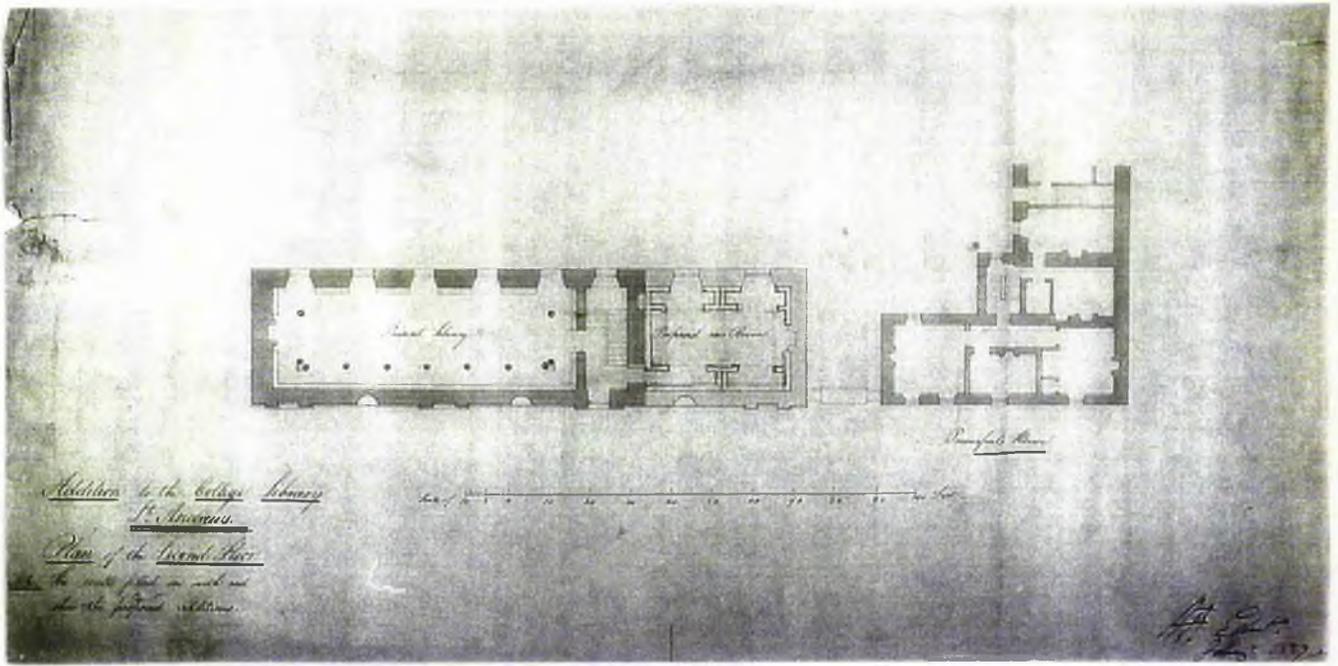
Library Extension. First floor plan, R. Reid, January, 1827.
